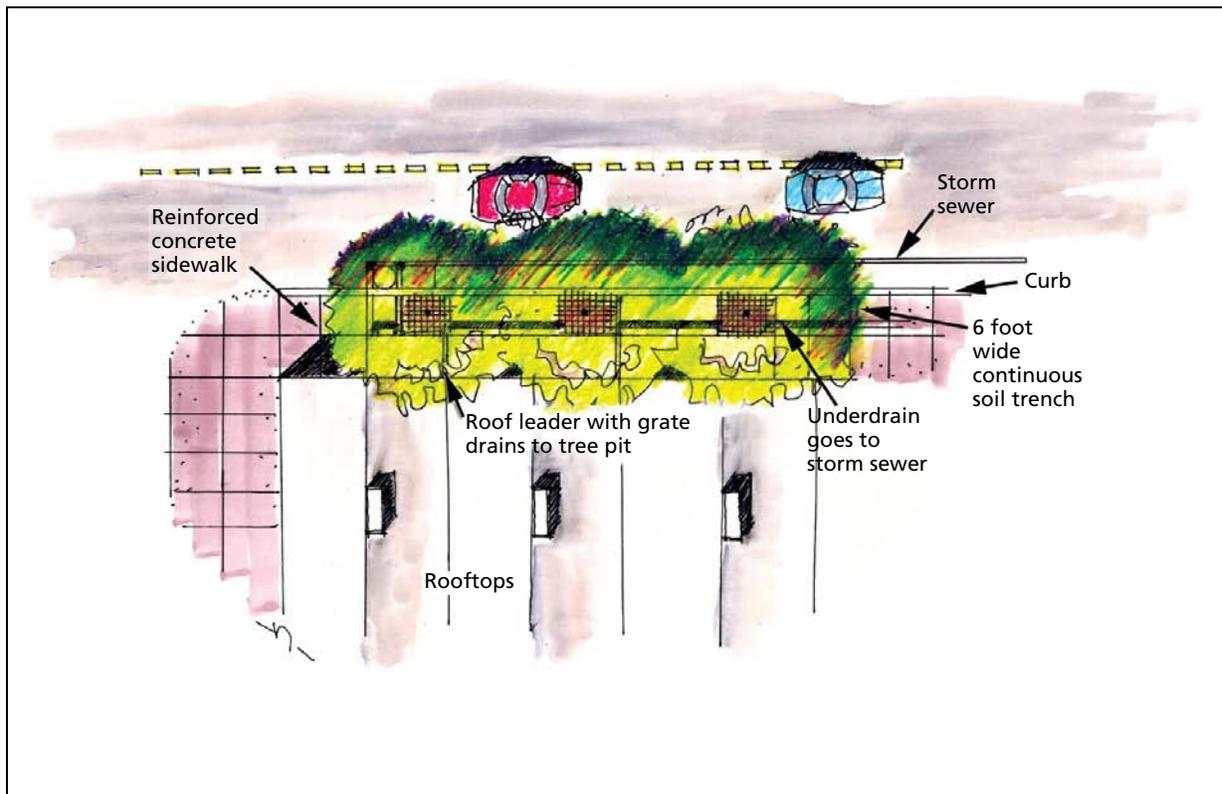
A linear storm water tree pit (plan view) collects and treats storm water that is directed from rooftops.
